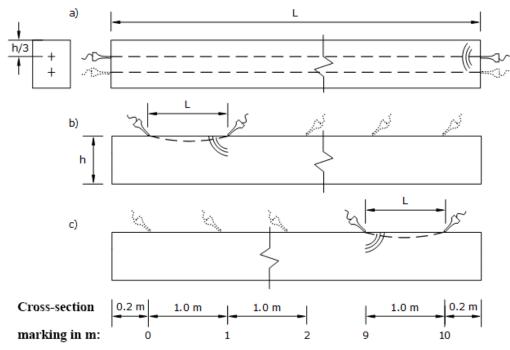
Details of the marking of the pieces, end-to-end (a) and surface (b) measurement.
